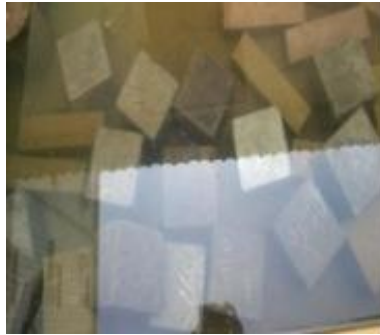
Curing of specimen cubes, beams and cylinders in curing vat
